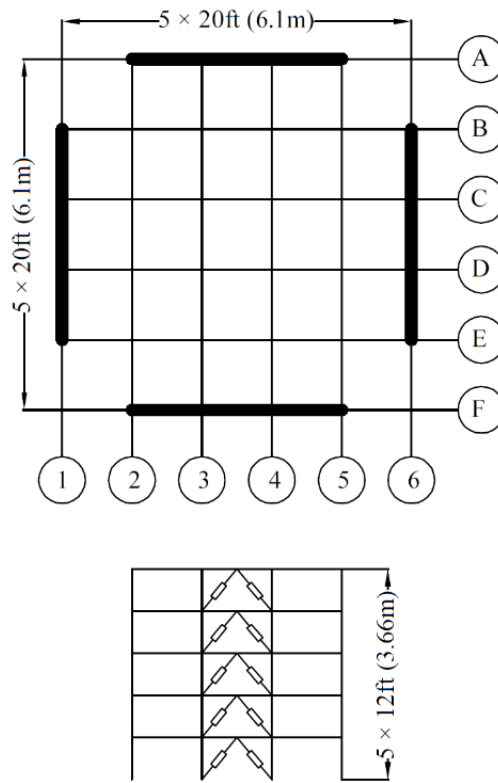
Plan and elevation view of the selected steel frame building and configuration of dampers
